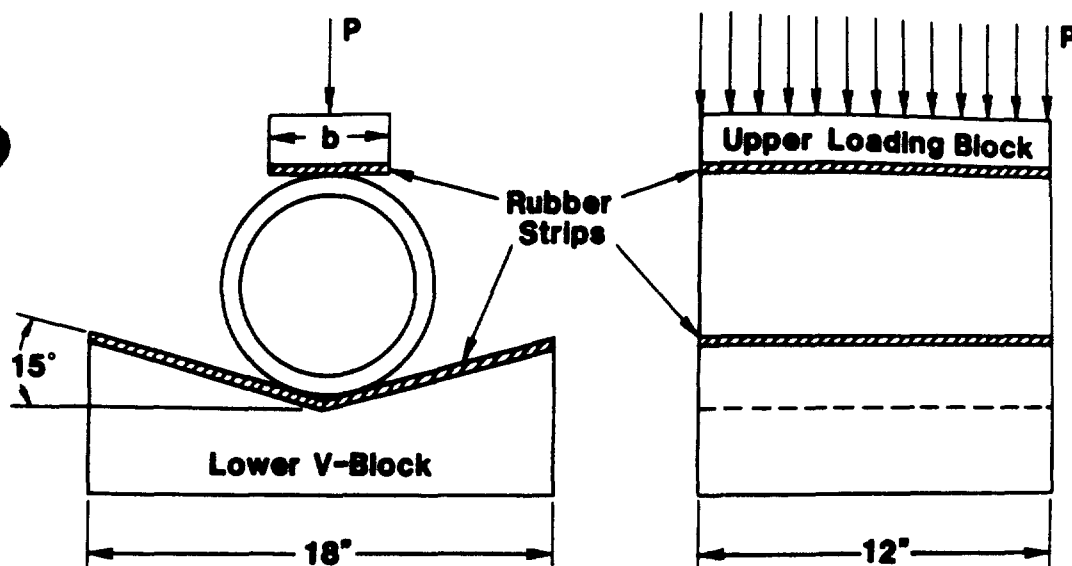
Assembly for V-Shaped Crushing Strength Test
